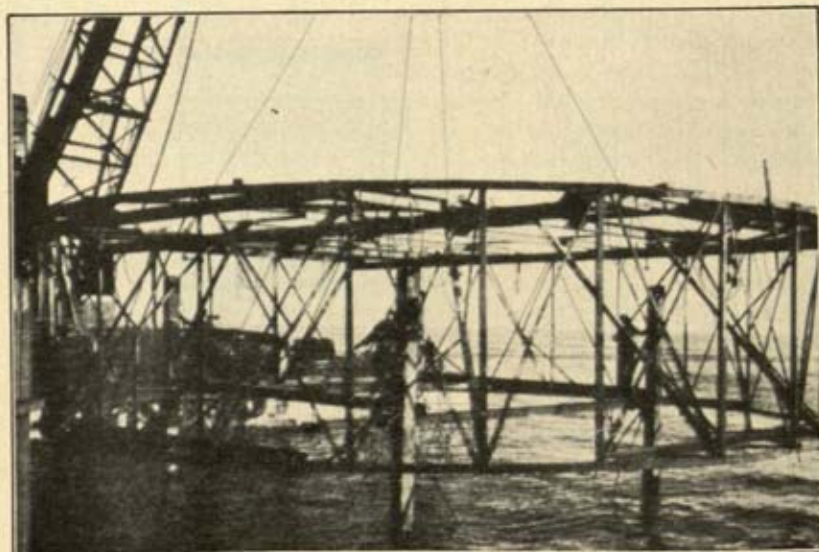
Prefabricated circular template is lowered over H piles.
